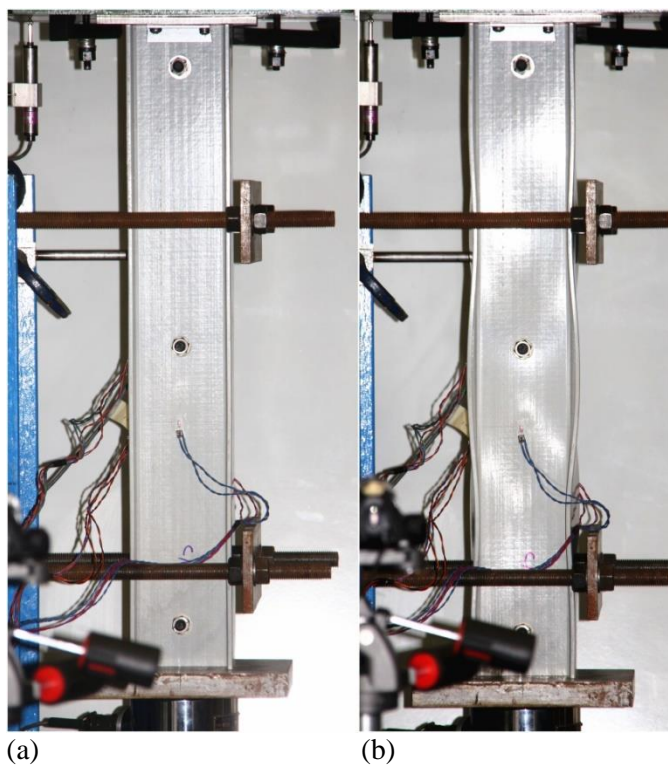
Local buckling test on C1 specimen: (a) under compression; (b) local buckling failure
